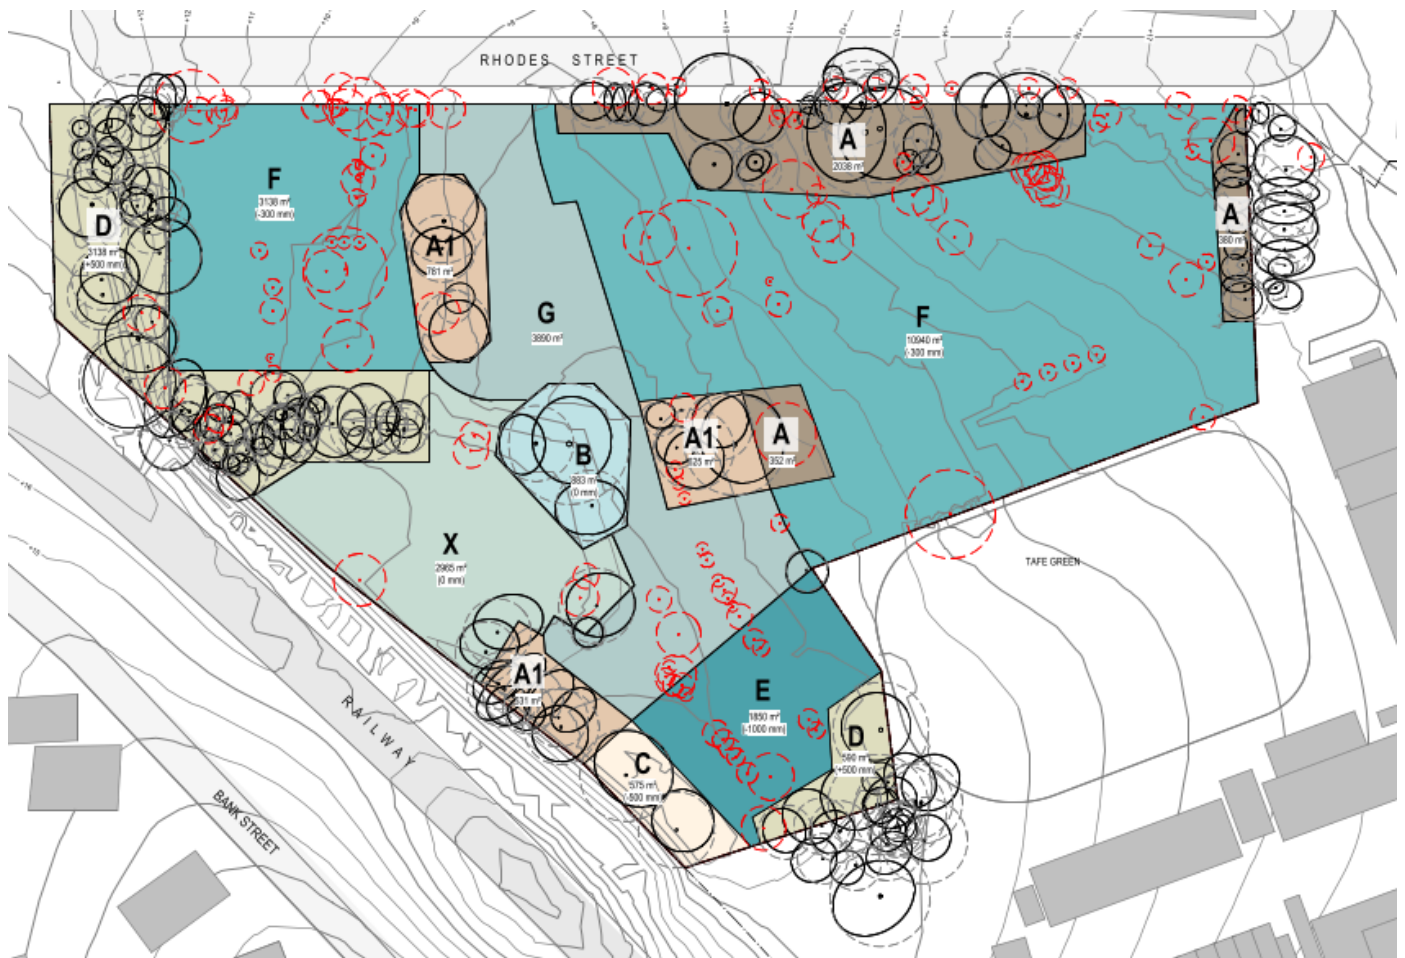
Extract from the Remediation Plan demonstrating the extent of works.
